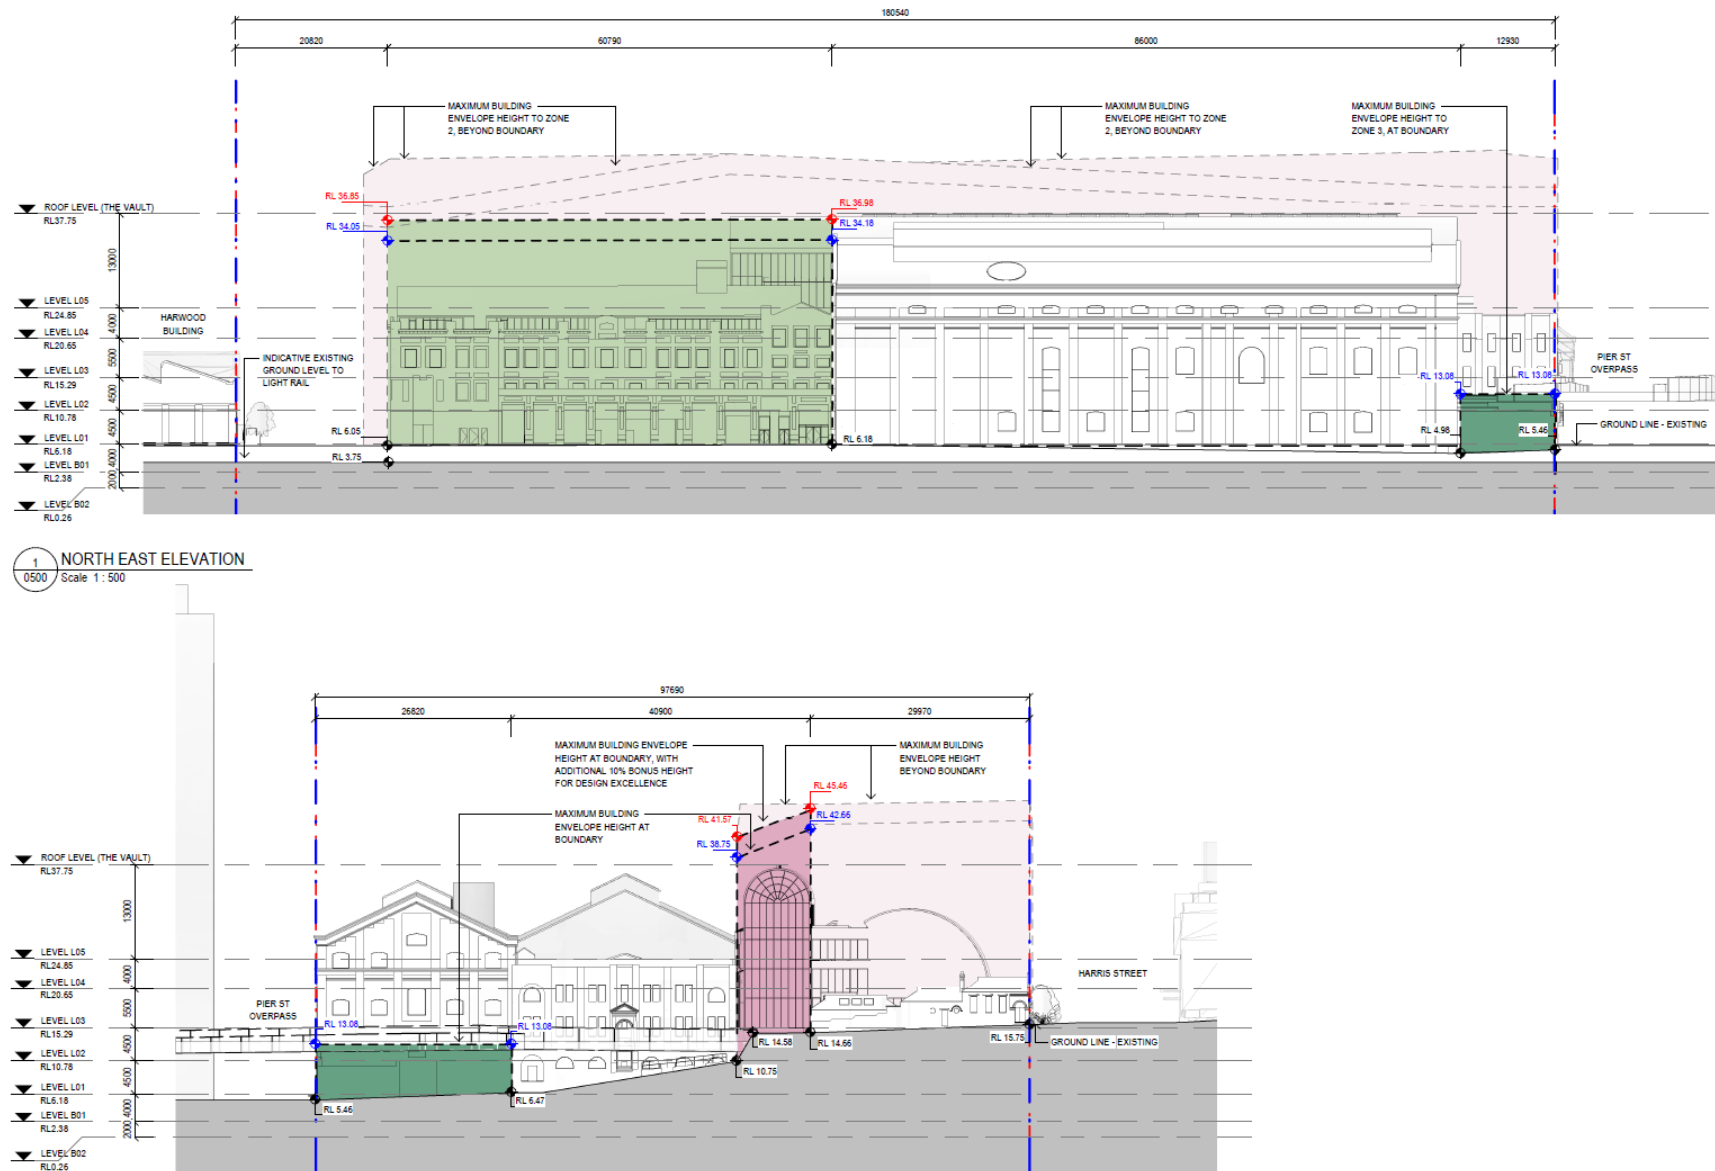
Ultimo Powerhouse- Reference Design NE & NW Elevations (Source: John Wardle Architects, 22 Feb 2022))
